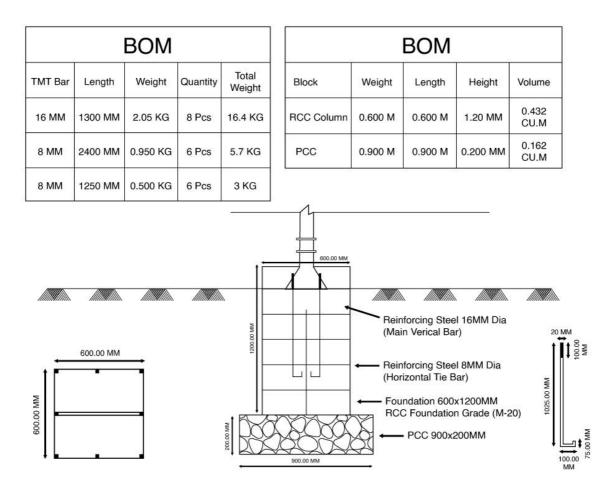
Foundation Design for 8 MMS (Module Mounting System)
